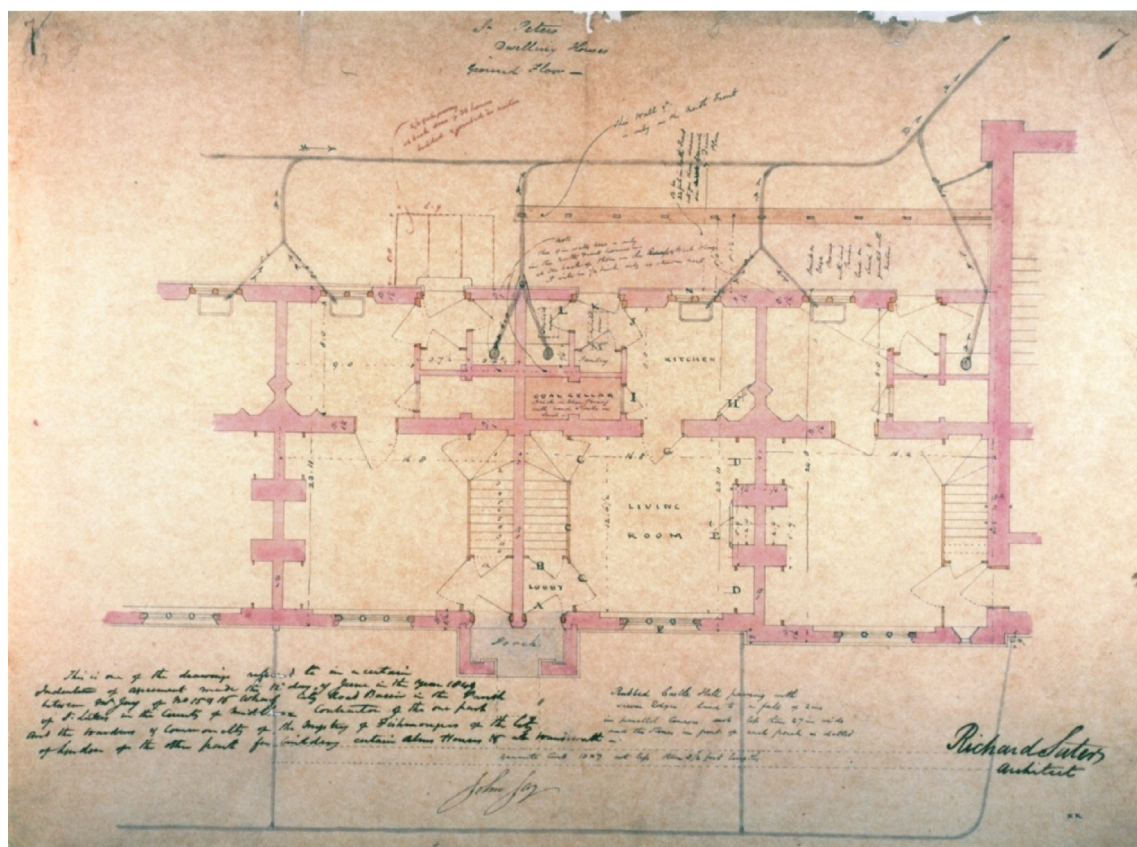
Fishmonger's Almshouses, Ground Floor Plan
